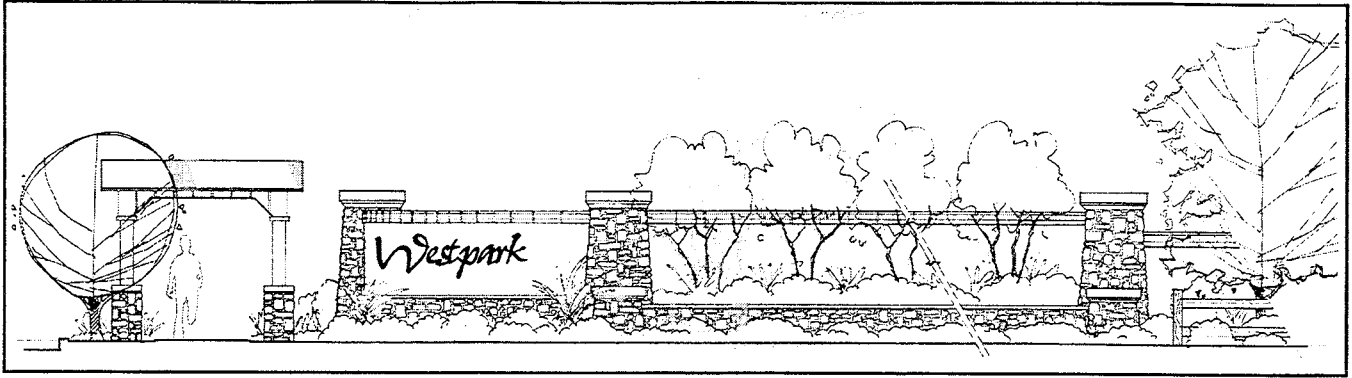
City Gateway or Neighborhood Entry Concept - Elevation View
